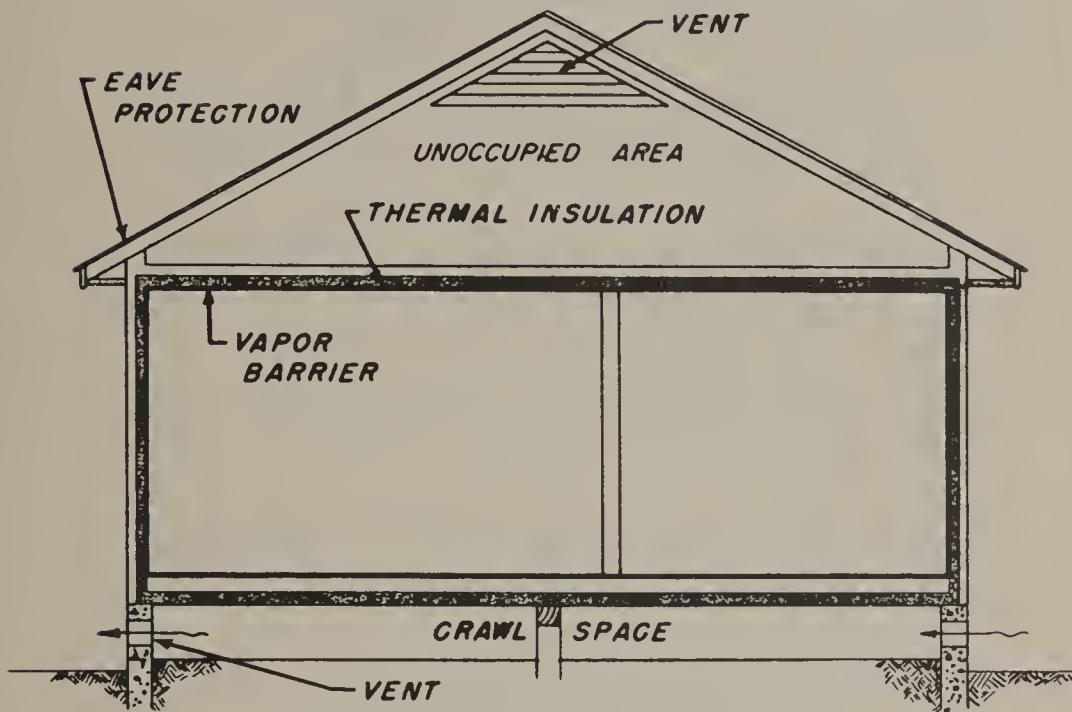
Basementless house, one-story.* Condensation control is effected by the use of a vapor barrier near the warm surface of outside walls and ceilings and floors and by ventilation of the attic and crawl spaces. The vapor barrier in the floor below the thermal insulation protects the finish floor from dampness that might exist in the crawl space and in this case the barrier should be placed below the finish floor. Vapor barriers should be provided in condensation zone I for ceilings, walls, and floors; in zone II for walls and floors; and in zone III for floors. Ventilation should be provided in the side walls of the crawl space for all three zones. Thermal insulation should be included in all walls, ceilings, and floors of condensation zones I and II. Eave protection in the form of one course of roll roofing is recommended for zones I and II where wood or composition shingles are used. In zones I and II ice dams may form over the eaves causing water to back between the shingles and into the building.
